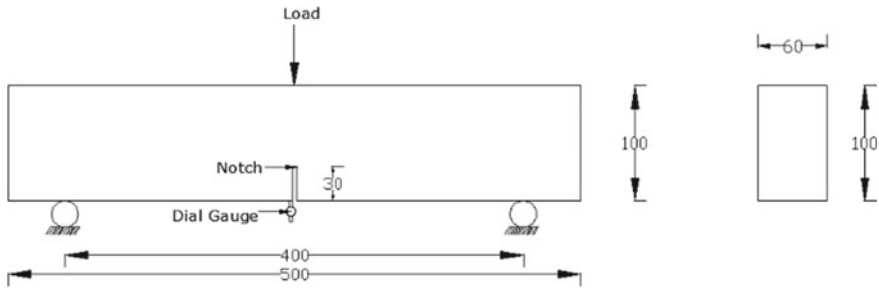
Specimen details and testing arrangement (all dimensions in mm)
